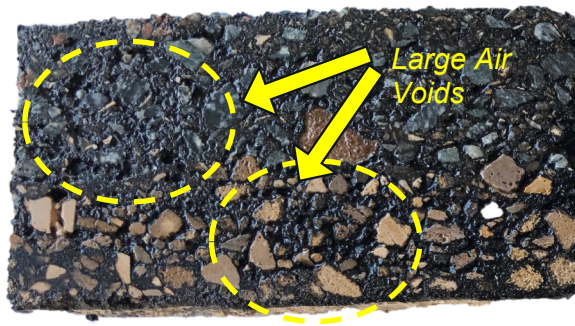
SR 20 MP 2.511 Worm Section Paving Lane Joint Cross-Section Showing Large Air Voids in Both AC Layers
